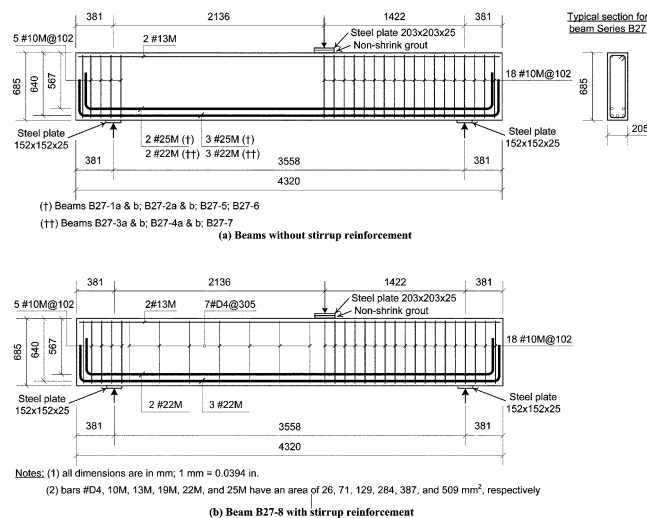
Geometry and reinforcement details for beams in Series B27. (Note: $1 \text{ mm}^2 = 0.0015 \text{ in.}^2$)
